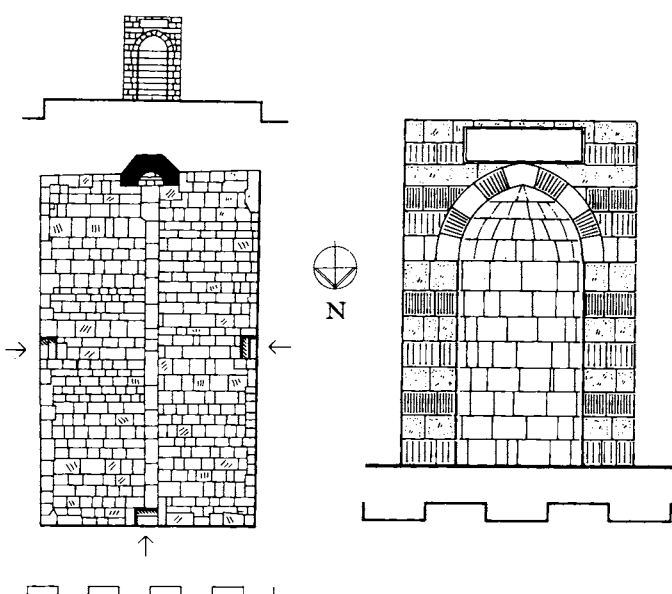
Mihrab 'Ali Pasha, plan and elevation.
